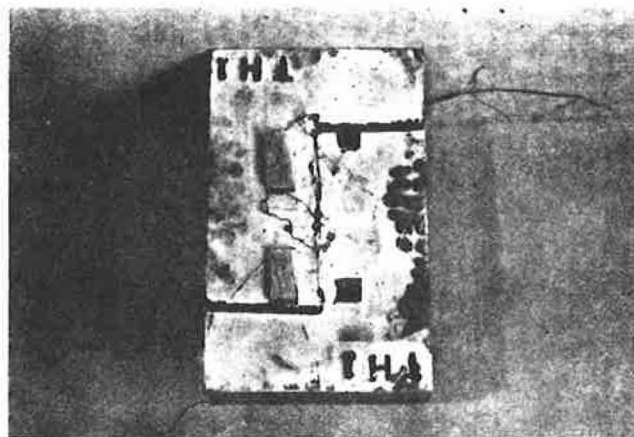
Typical failure of TM and TH specimens (spalling of regular concrete).
